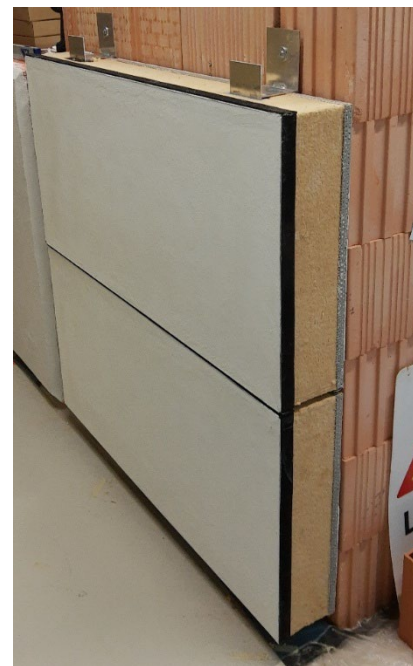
Prototype of prefabricated wood-fiber insulation panels mounted on lab test wall
